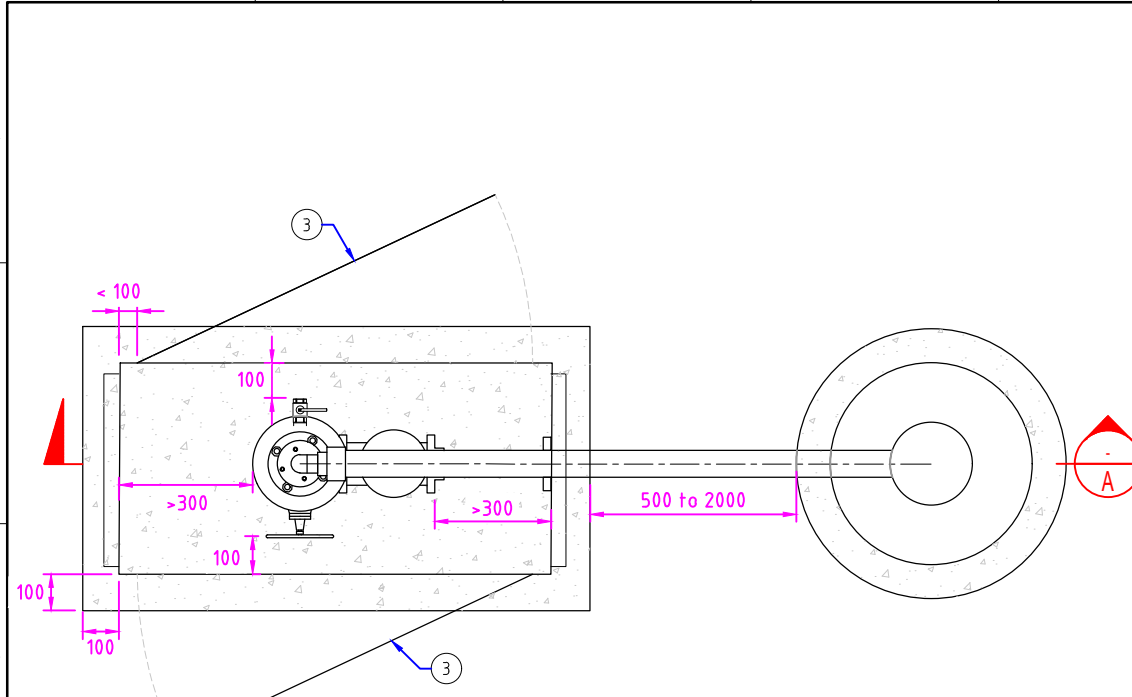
ABOVE GROUND AIR VALVE AND VENT ASSEMBLY (PLAN LEVEL IS JUST BELOW CABINET ROOF)
